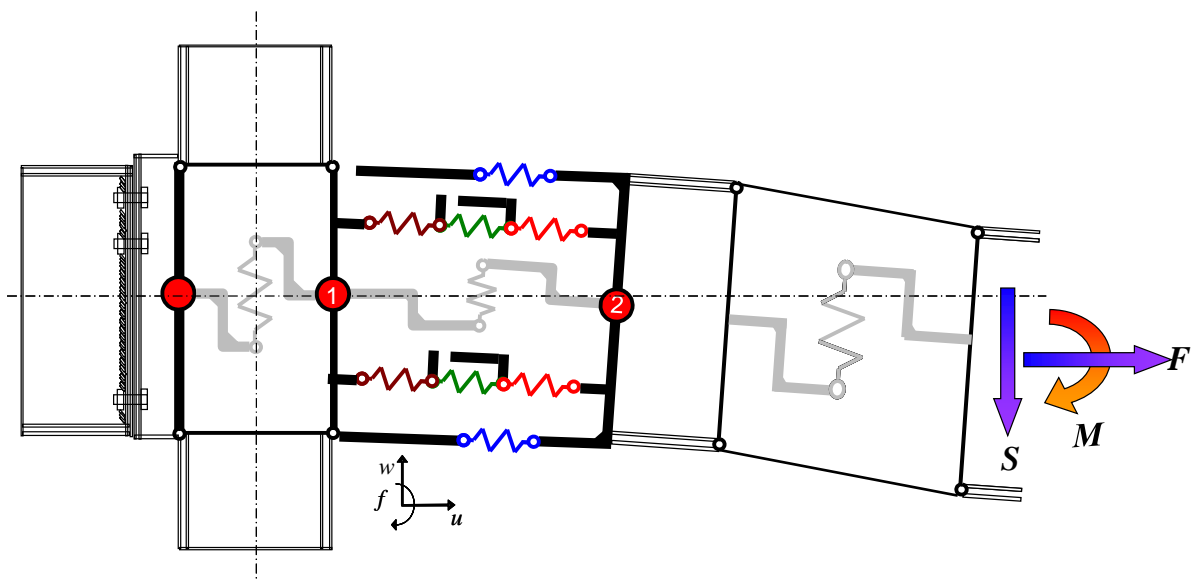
Deformation of component assembly and beam-end shear panel (Block, 2006)
